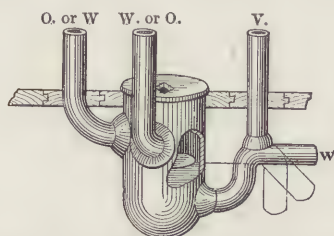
BATH DRUM TRAP WITH EXTENSION CLEAN-OUT COVER—WASTE INLET, OUTSET AND OVERFLOW WIPED IN—STYLE, —WITH SEWER AIR AGAINST THE WATER-SEAL
